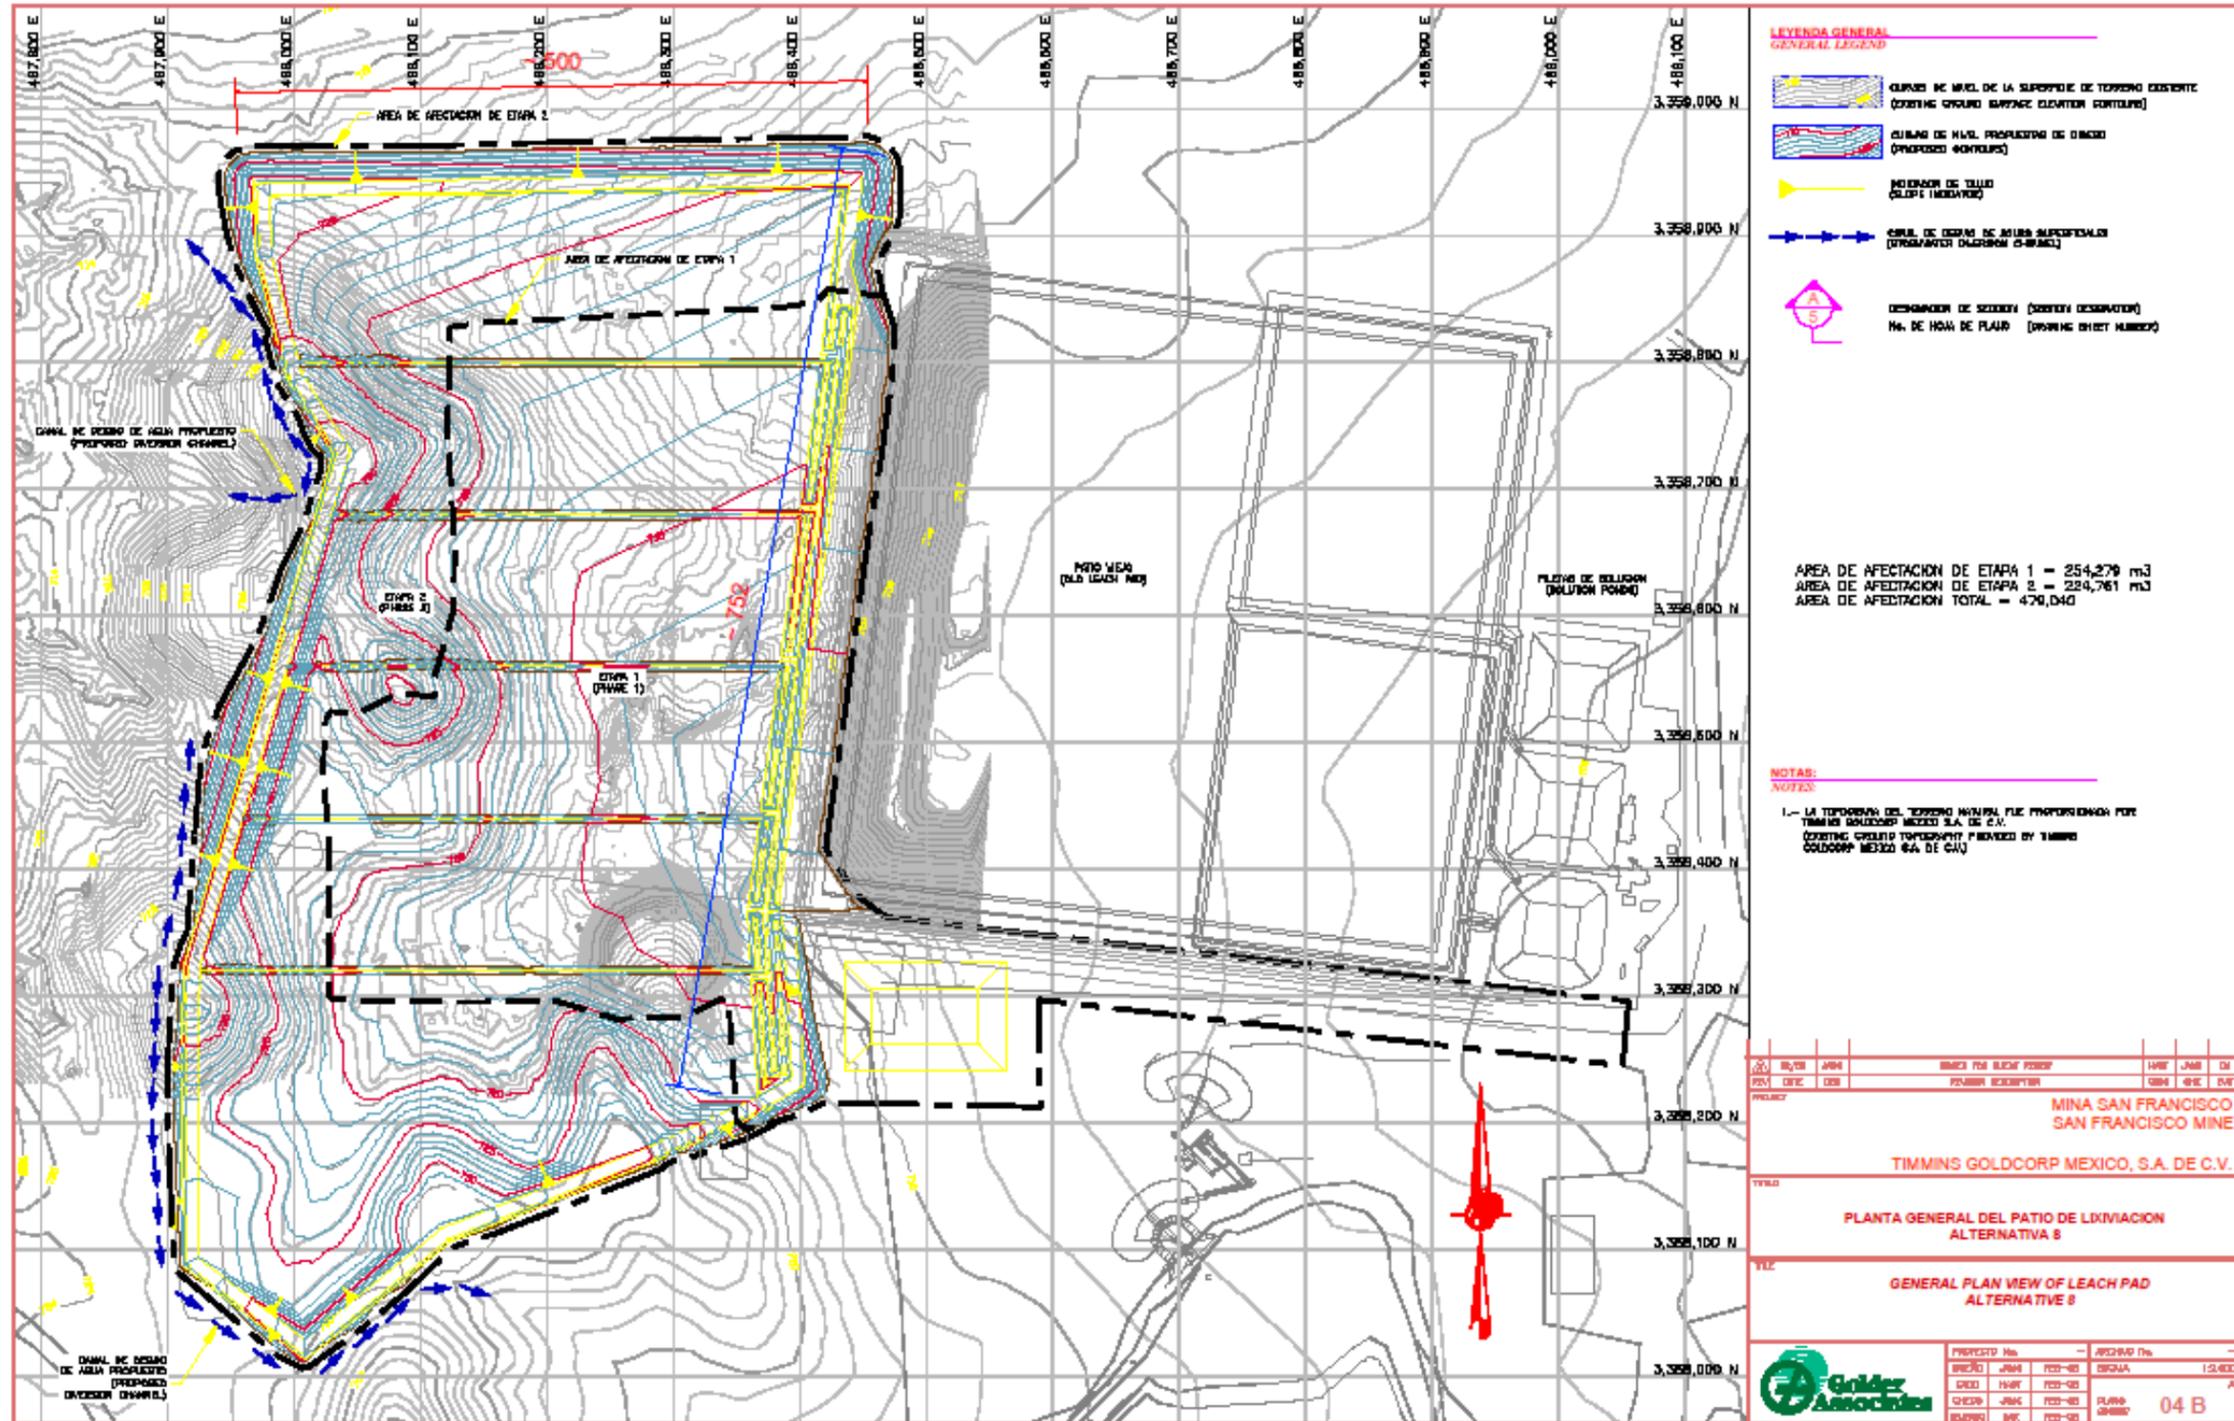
shows the proposed site layout, with schematic diagram of the proposed leach pad location and Figure 18.15 illustrates the crushing plant flow diagram.
